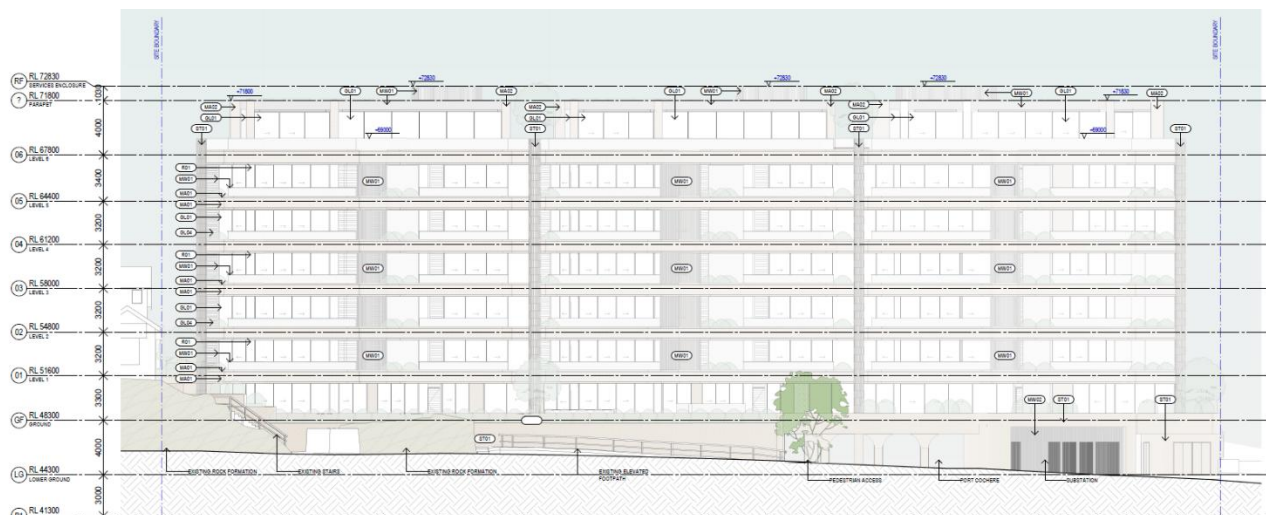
Extract of the General Elevations – South (Rangers Avenue).
